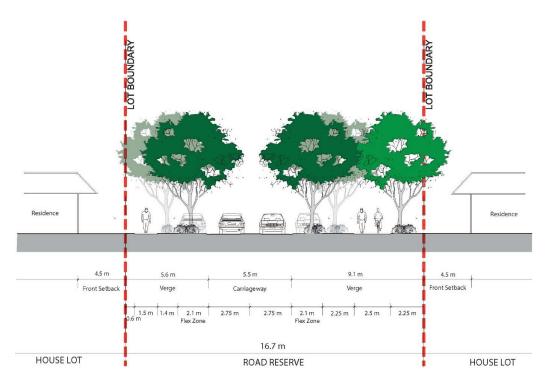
Green Link Road Cross Section (Flex Zone)
